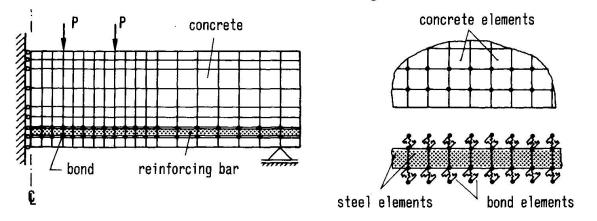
Finite Element Idealization of a Reinforced Concrete Beam
